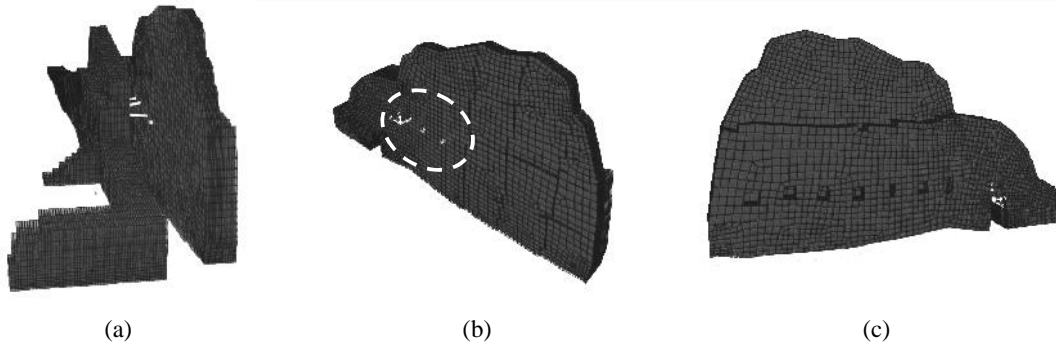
Tested hypothesis: (a) first: numerical model of the two walls; (b) second: numerical model of the instrumented wall with springs representing the timber struts; and (c) third: numerical model of the wall considered as disconnected with the other one behind it
